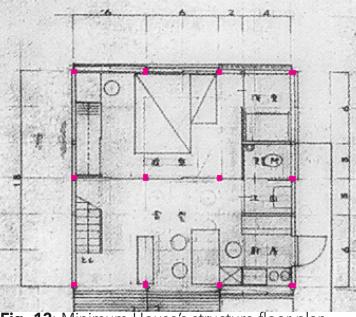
Minimum House's structure floor plan Image: The Japanese House p 044. Additional illustration: Daniel Vu Structural Expression
